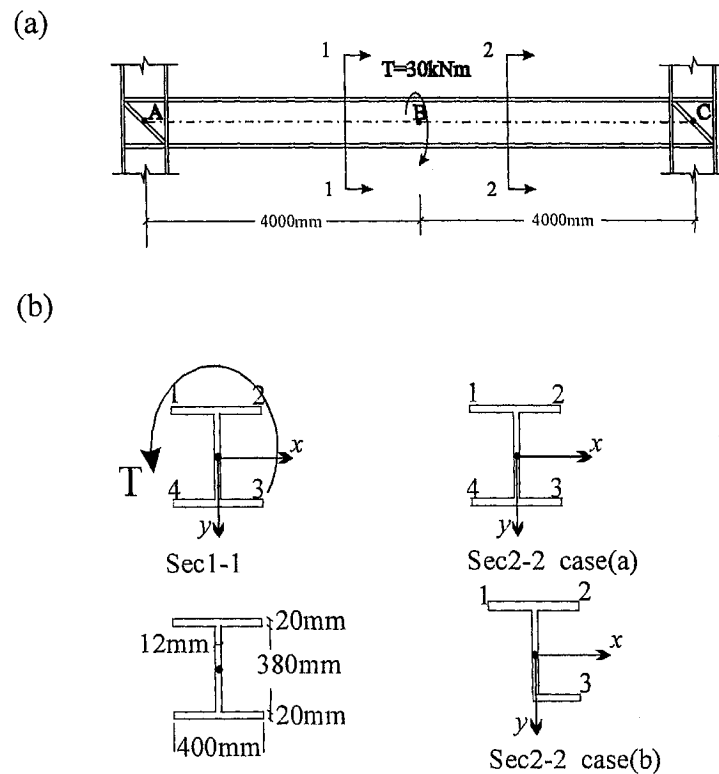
Example III.1:beam with coped flange. (a) Geometry, (b) cross-sectional dimensions
